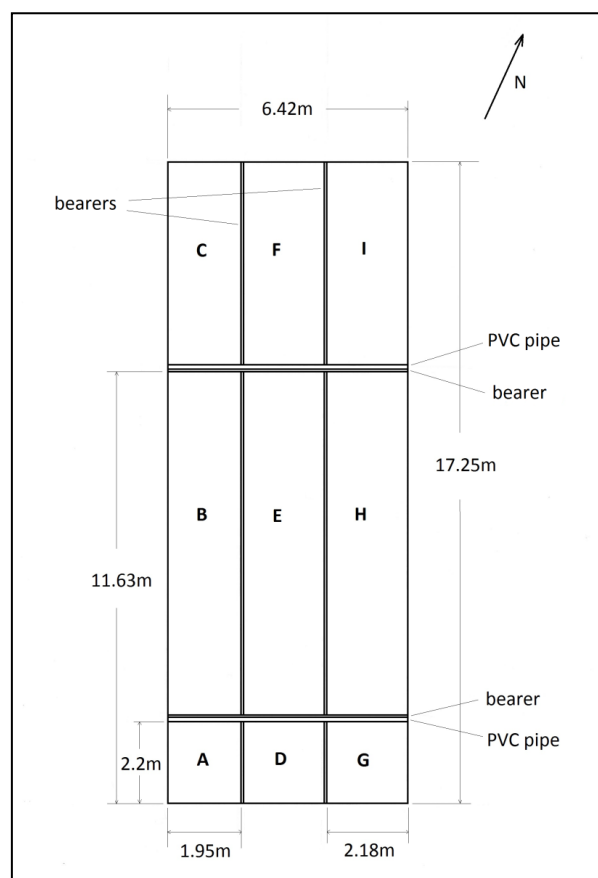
Internal sub-floor area (Married Persons Quarters) divided into 9 spaces A – I.
